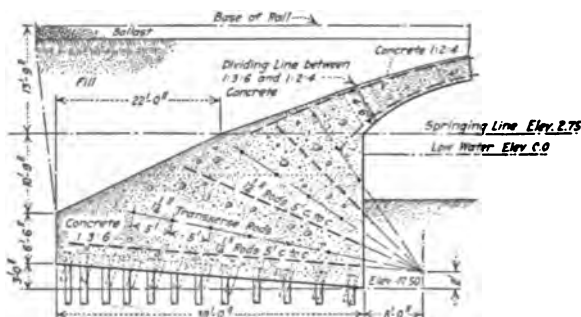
Abutment of causeway arch construction, Galveston, Texas.
